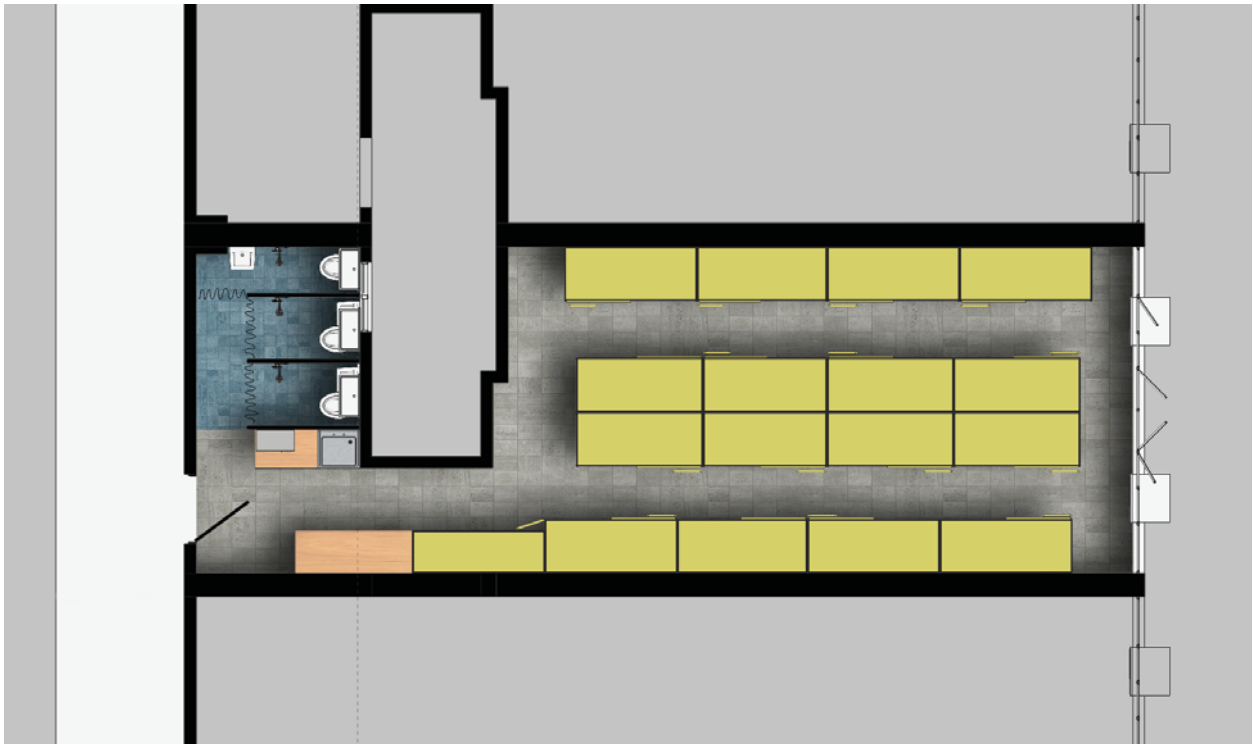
Floor plan of Lucky House Bedspace Apartment
